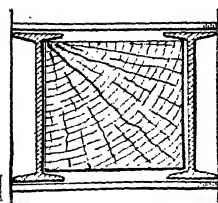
A.—Method of reinforcing wood shore for heavy loads.
